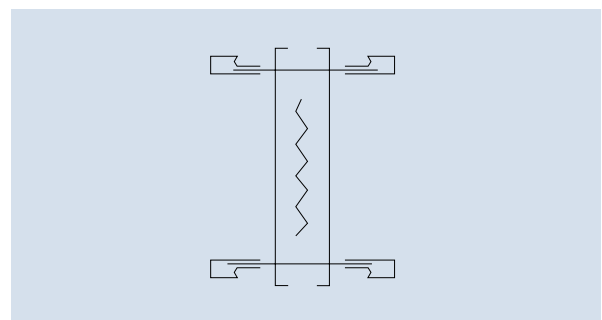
Method 4: Conversion to Flanged Coupling System
